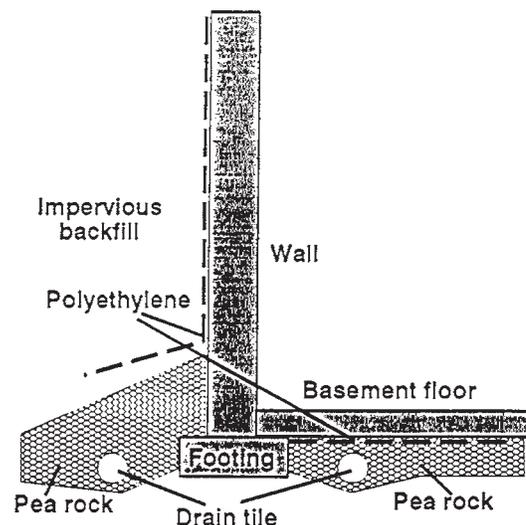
Cross section of basement wall and floor showing drain tile for new construction.
